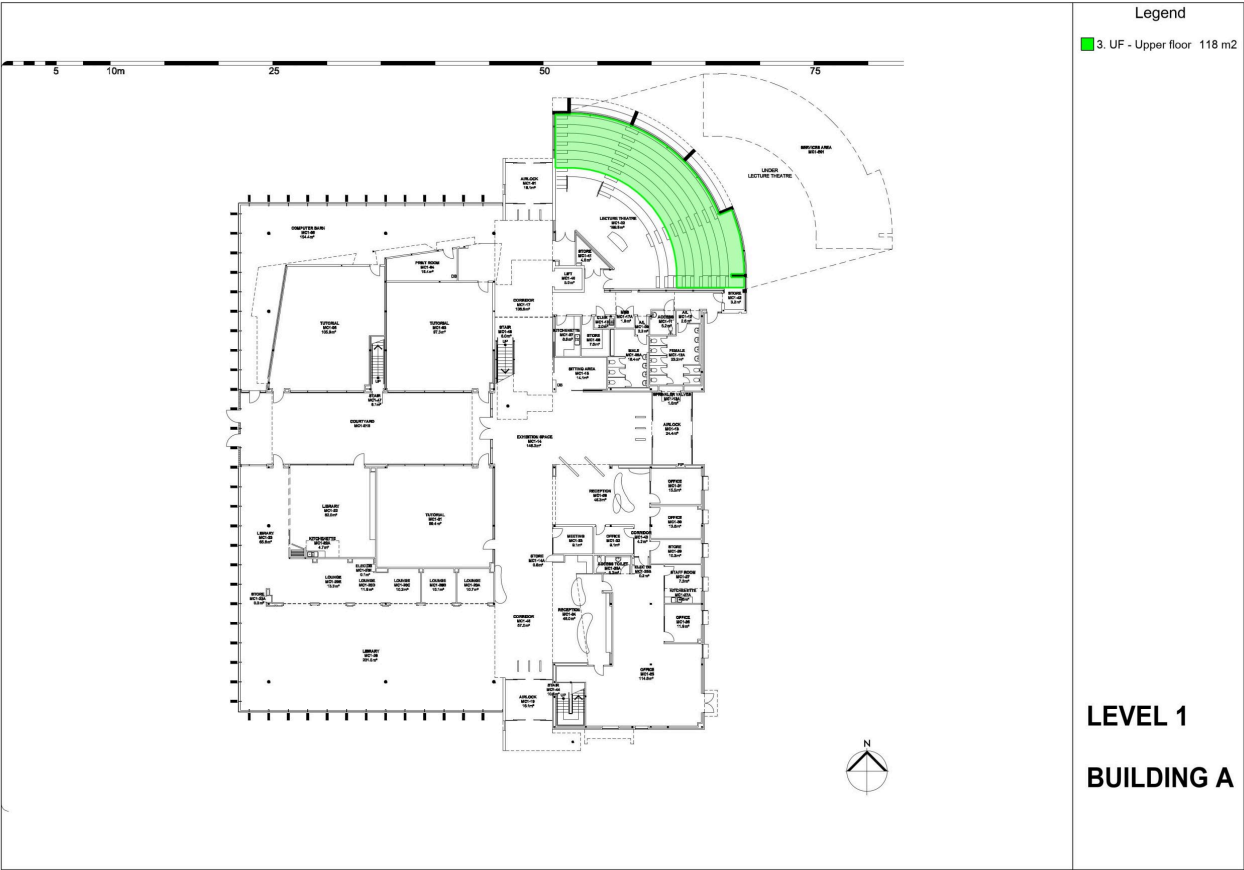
Building A – Upper Floor (Level 1) measured as per ACMM (AQIS, 2022)
